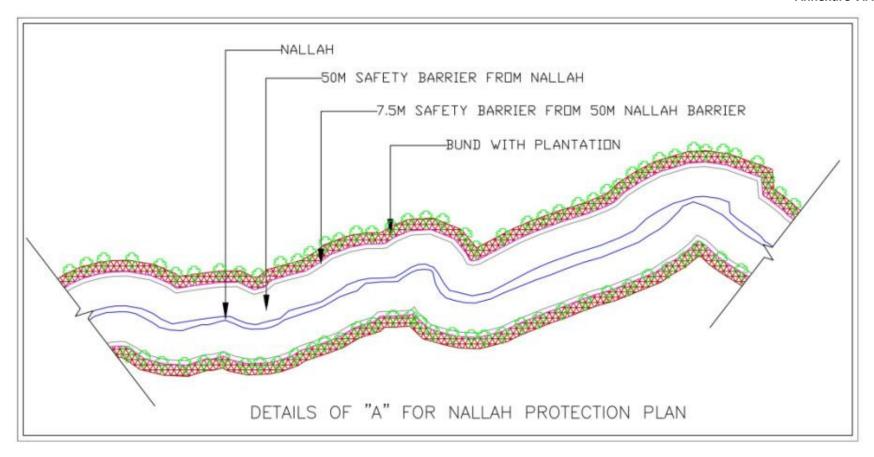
Safety Barriers and Protection Plan for Seasonal Nallahs (Top View)
